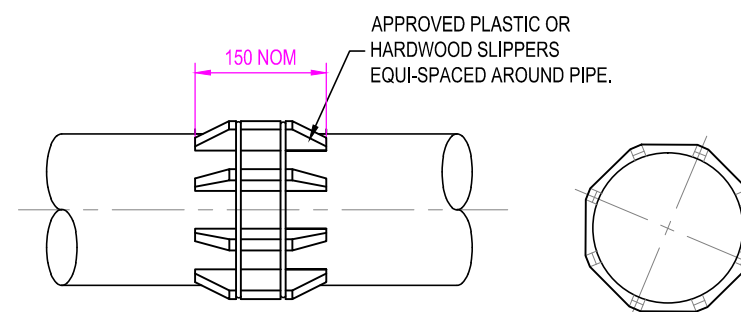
DETAIL D: PLAN VIEW: RAILWAY / FREEWAY CROSSING
